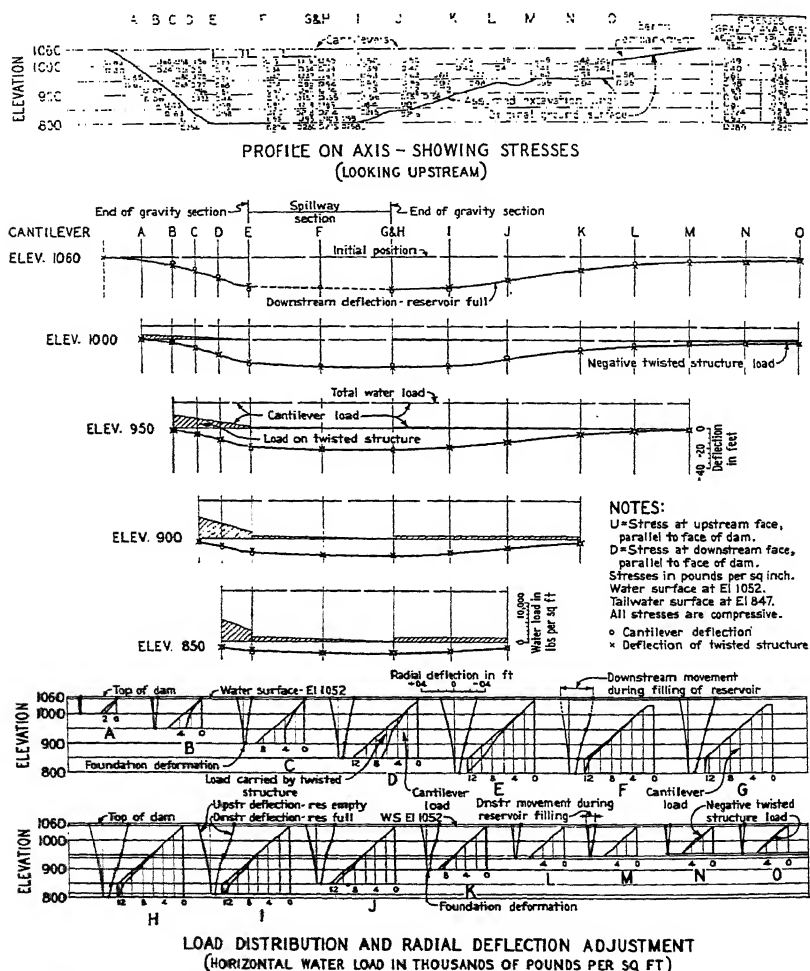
Trial load twist analysis—Load distribution and adjustments on horizontal elements—Reservoir full stresses and load distribution.
